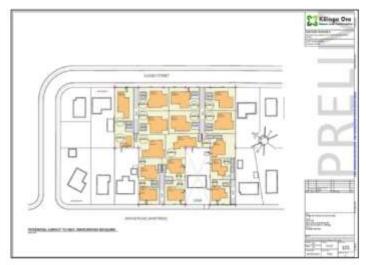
Permitted baseline layout plan (Source: Information provided to support application on June 8 2022)
